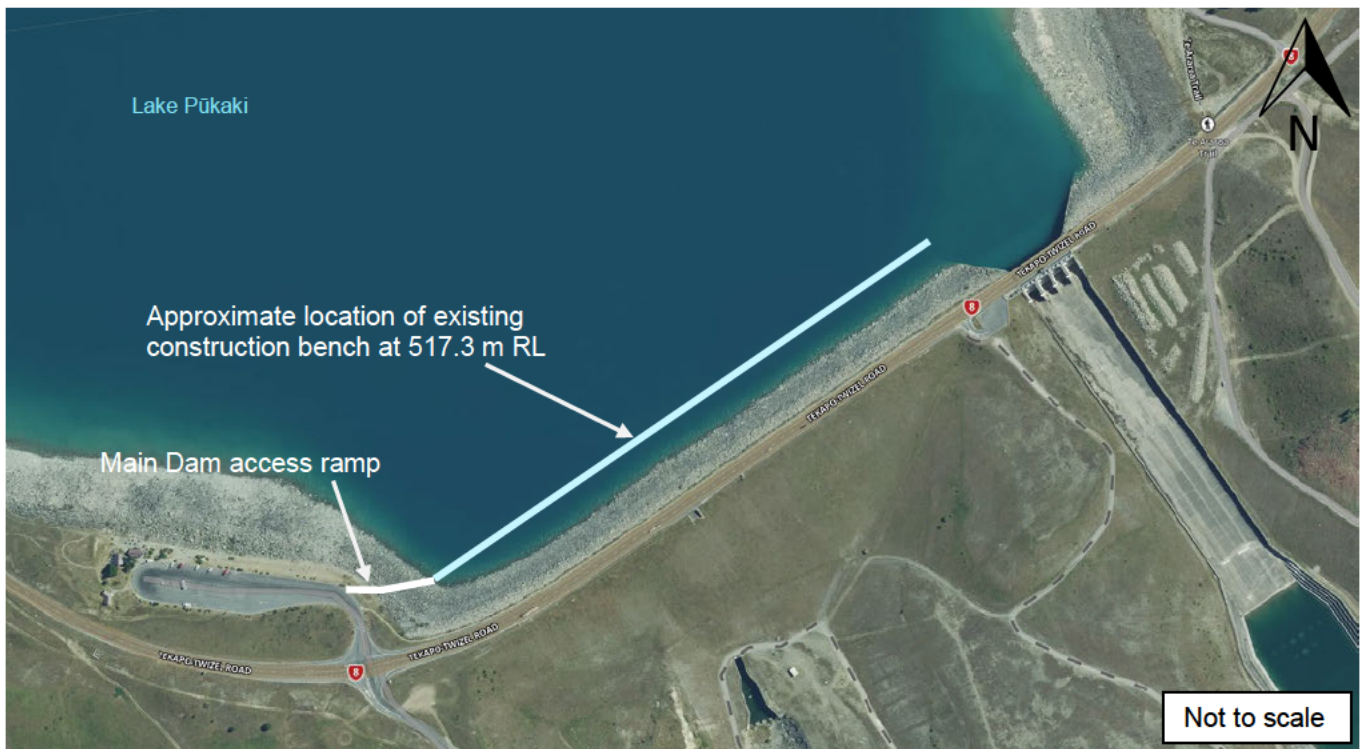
Site plan (Main Dam) – Tranche 1 - indicative 517.3 m RL construction bench
